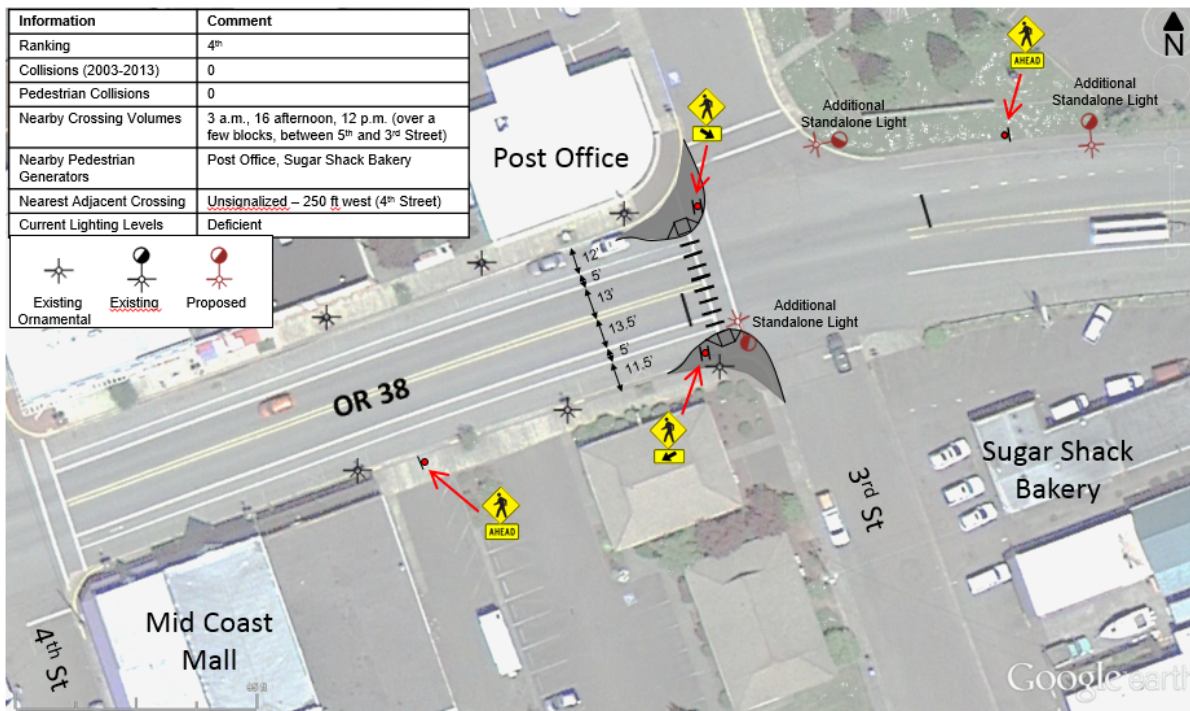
OR 38/3rd Street Crossing Improvement Concept
